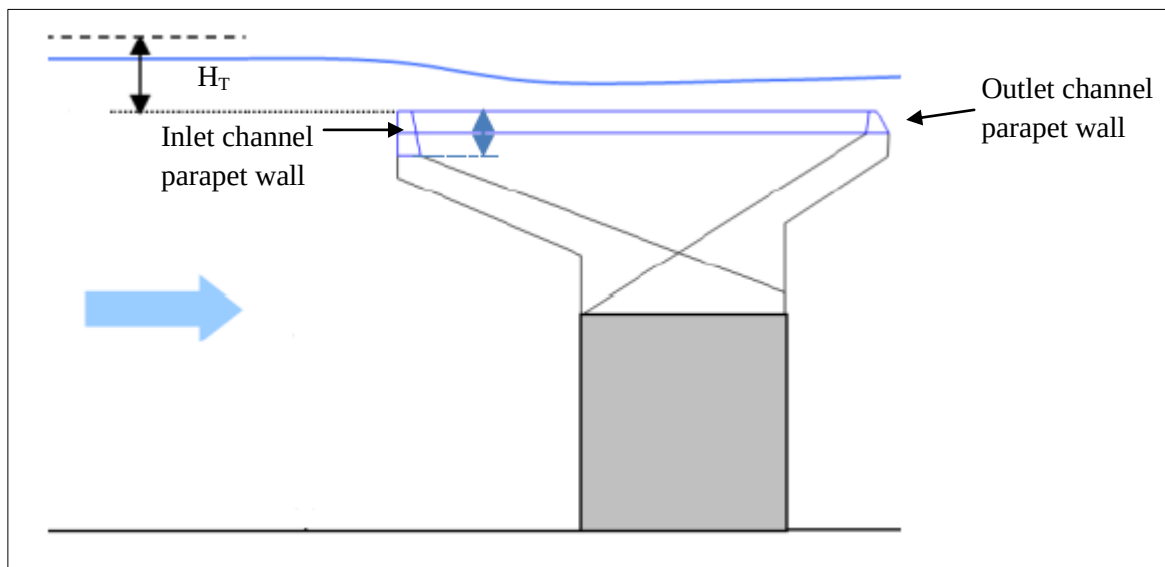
Side view of PKW showing difference in inlet and outlet channel parapet walls
